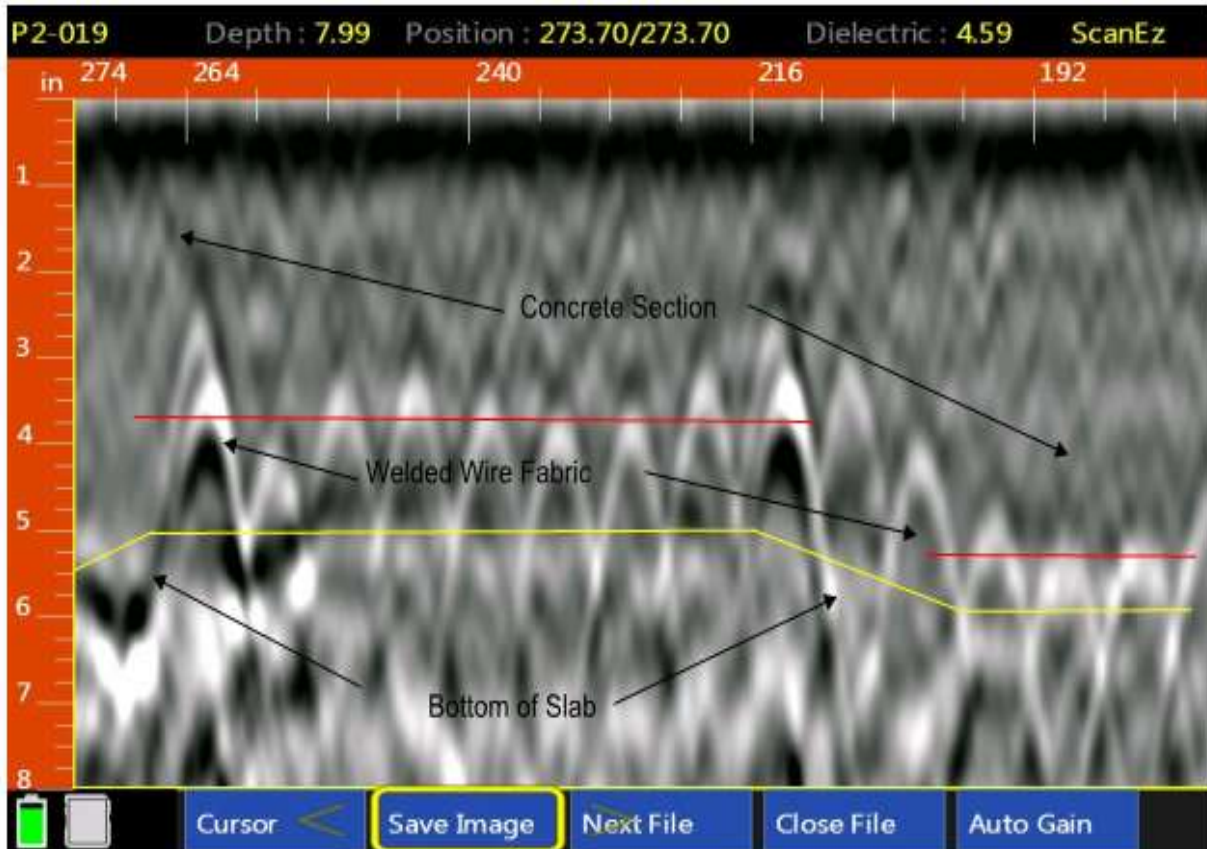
Radiogram view of driveway slab showing interpreted concrete section, presence of welded wire fabric reinforcement (3¾" to 4¾" depth), and bottom of concrete slab (5" to 5½" depth).
